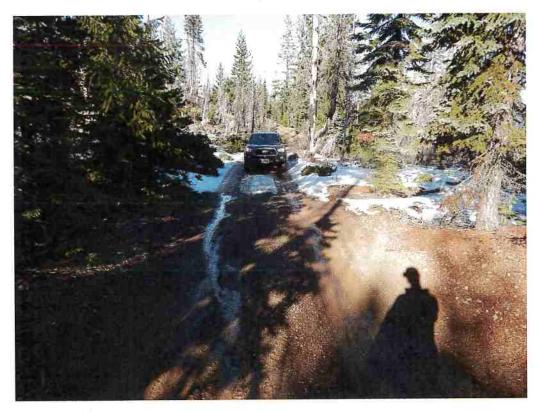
RP 4. Vehicle traveling south, photo taken facing north.
